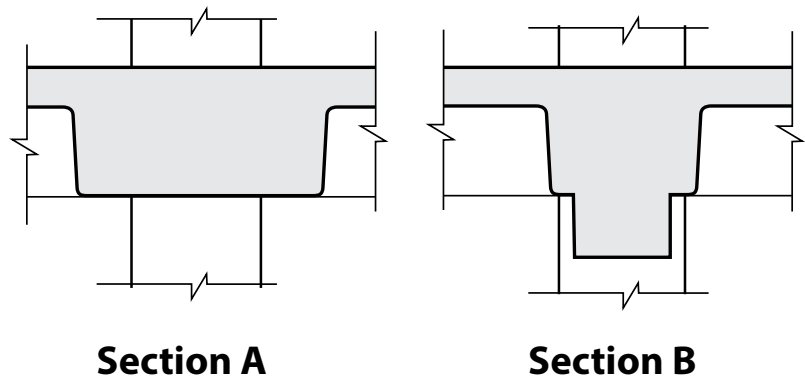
Pan systems are most efficiently applied when the floor framing has a consistent soffit elevation. Interior and exterior beams and girders should match the pan depth plus slab thickness whenever possible (Section A). If girders are designed with greater depth, the shored deck supporting the pans must be interrupted and the extended depth requires additional formwork for the sides, soffit, and shoring (Section B).
